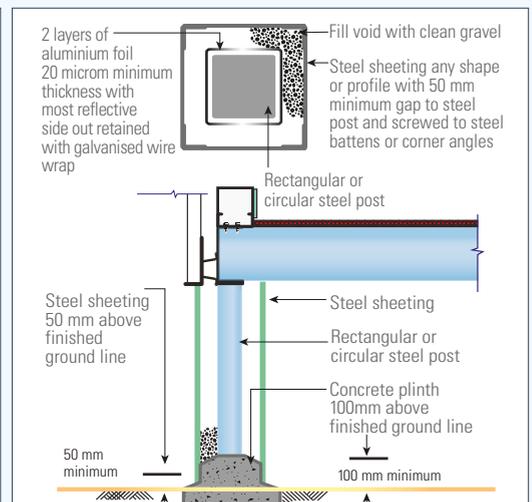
(a): Reflective foil with steel shield thermal barrier
